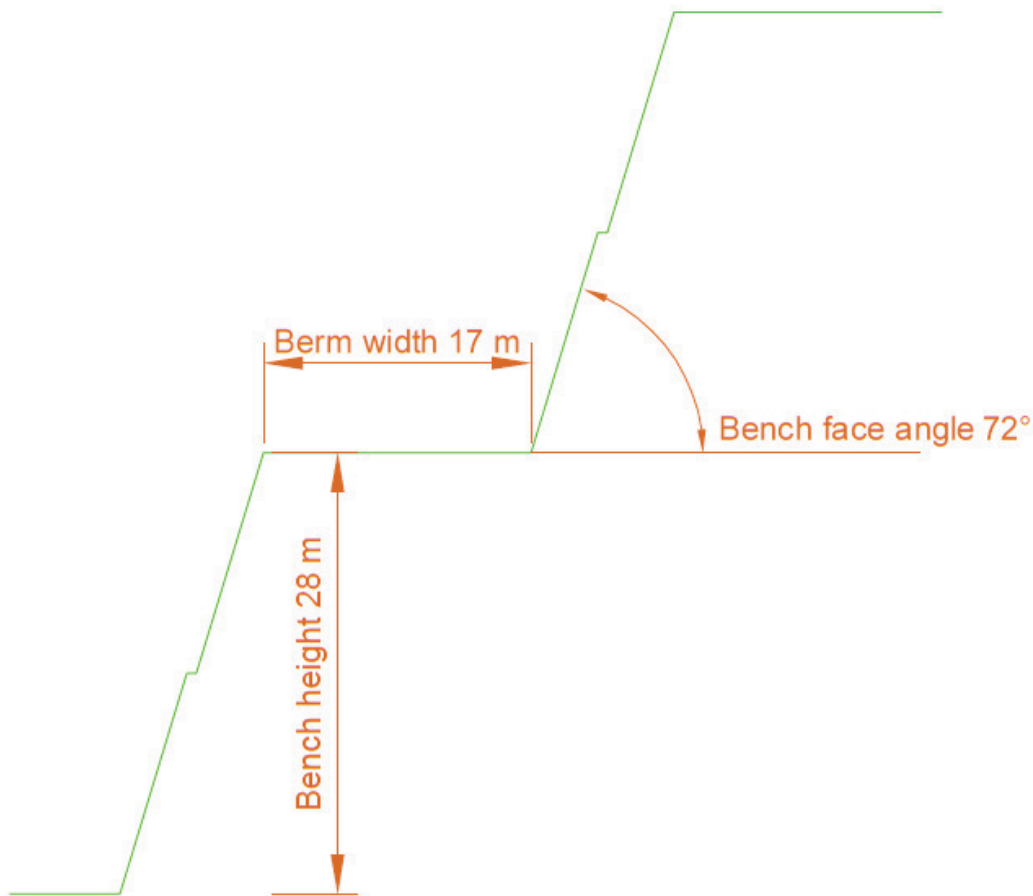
Section of current general bench design at Siilinjärvi. Ramps are 40 meters wide.
